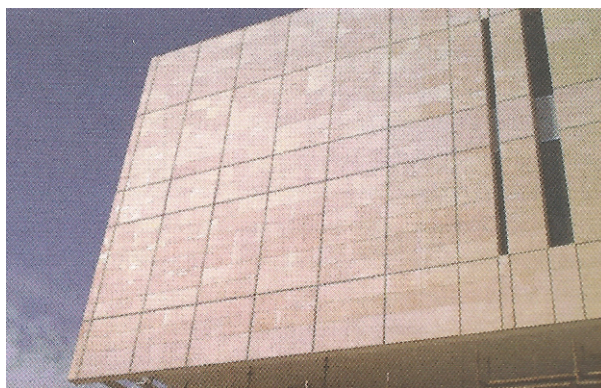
Building with a ventilated rainscreen façade and a cladding made of natural stone (Faria, 2008)
